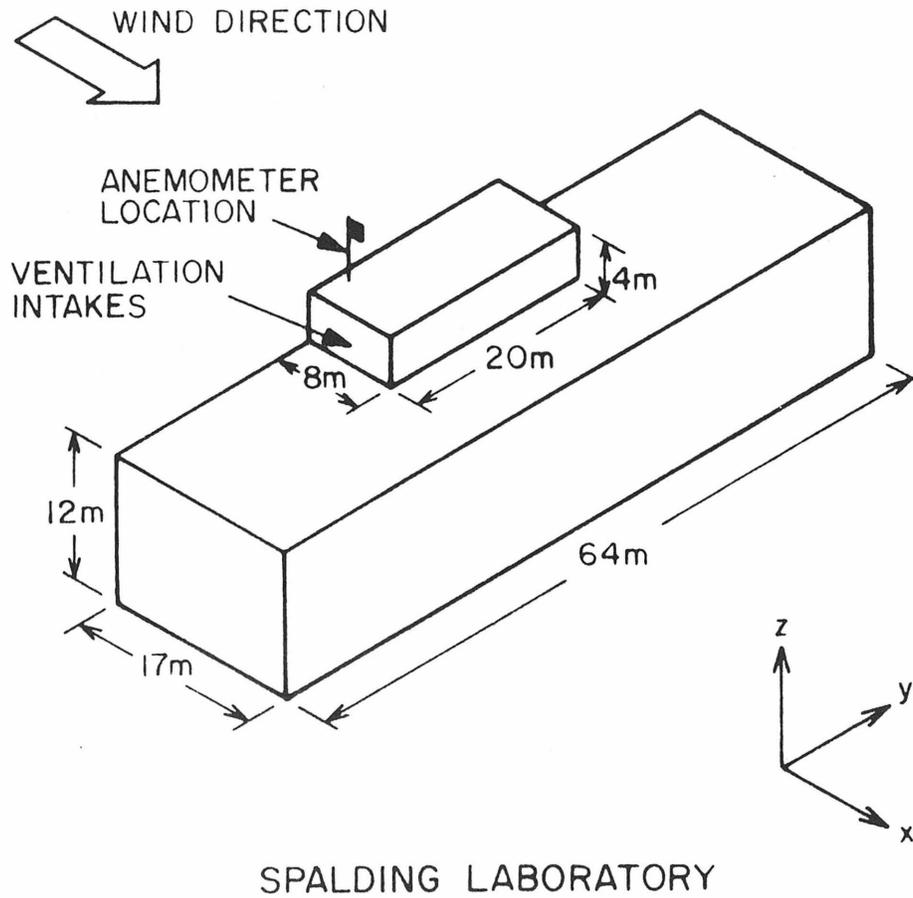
Spalding Laboratory, the three-story building tested, showing the wind direction and coordinate system.
